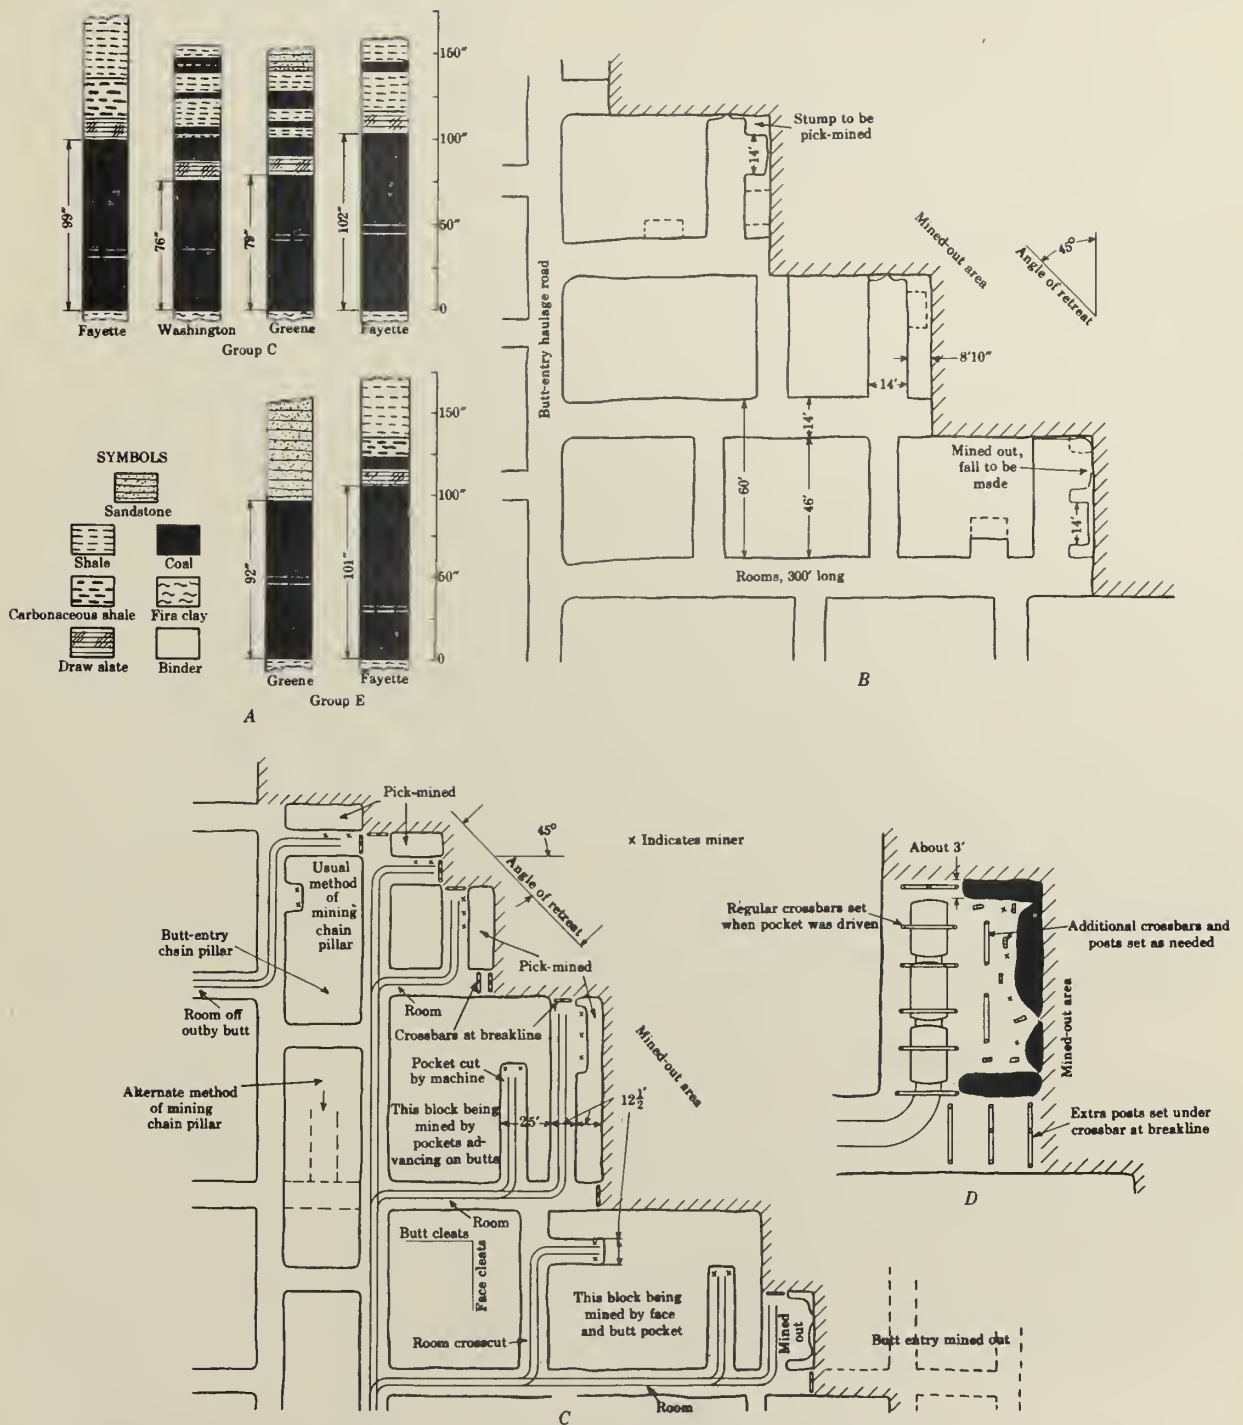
Coal and roof sections and methods of pillar extraction for mines in Fayette, Greene, and Washington Counties, Pa., group C, type E: A, Representative sections of coal bed and immediate roof, groups C and E, type E mines; B, method of pillar extraction by butt pockets only for rooms on 60-foot centers; C, method of pillar extraction for rooms on 100-foot centers; D, details of timbering in pillar pockets (same mine as shown in 16C).
